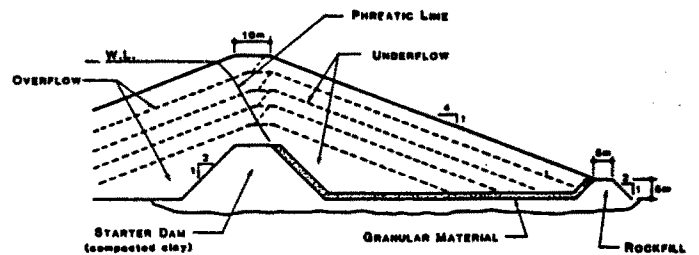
Typical Cross Section Used for the Disposal of Phosphatic Tailings (Whaler and Gifford, 1978)
